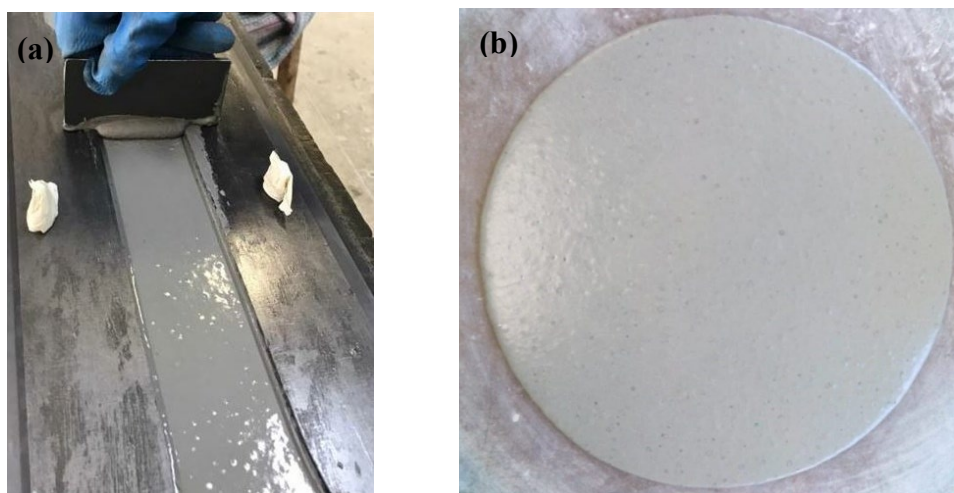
Appearance of concrete (a) and spreading of concrete (b).
